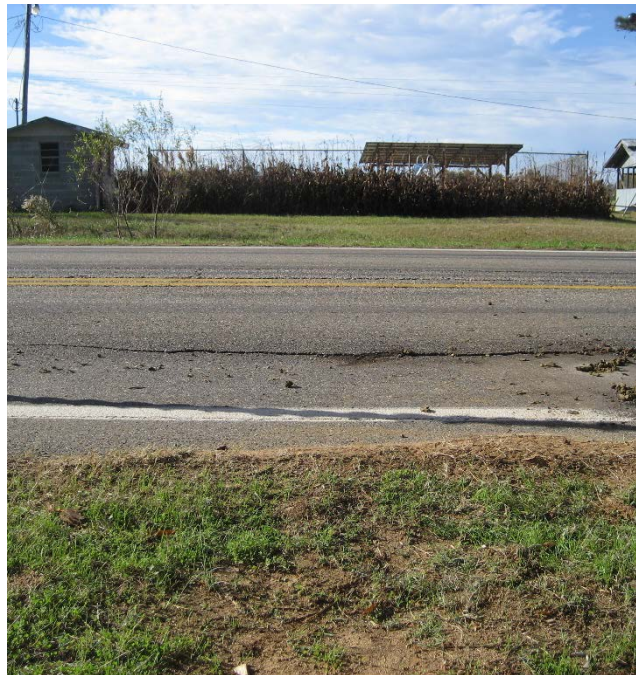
Longitudinal Crack in Travel Lane at AL-5
